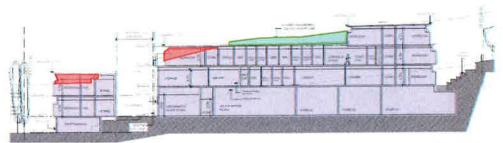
Section of the building showing the areas that exceed the standard (in red) and areas where the building is below the height standard (in green) (Source: MDP Architects)
